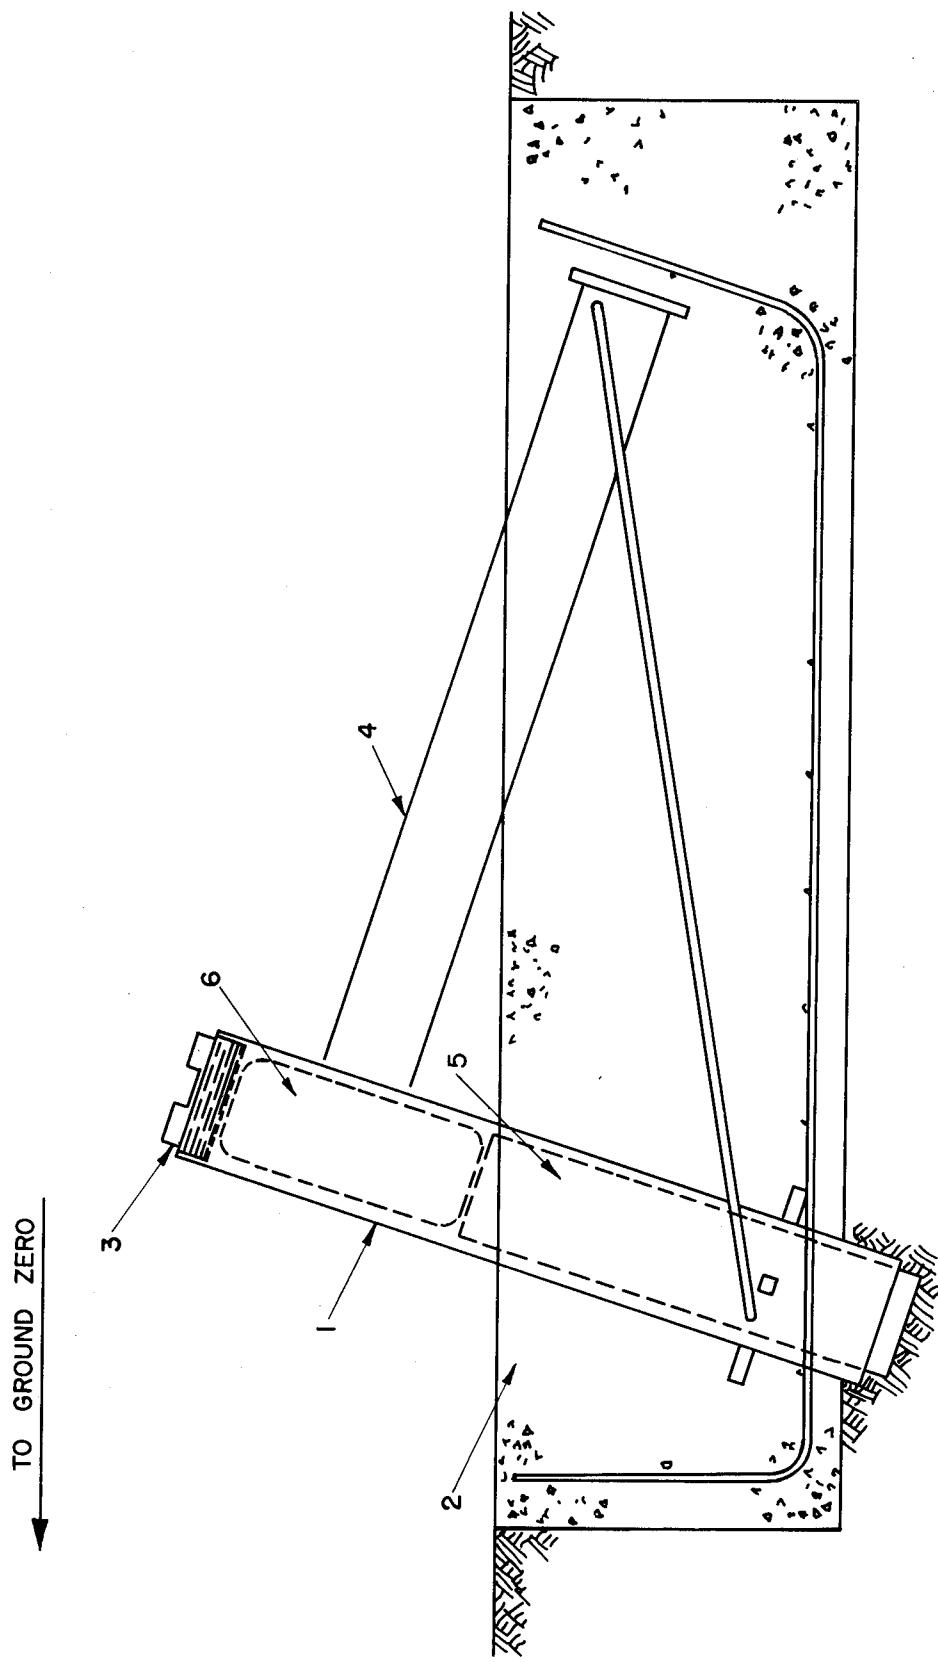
Design of Standpipe Station. (1) 6-in.-diameter extra-strong (0.437-in. wall thickness) steel pipe, 36 in. long, firmly imbedded in a concrete footing (2). (3) Threaded steel plug. (4) 4-in. steel-pipe bracing. (5) 4-in. wooden support. (6) Test materials.
